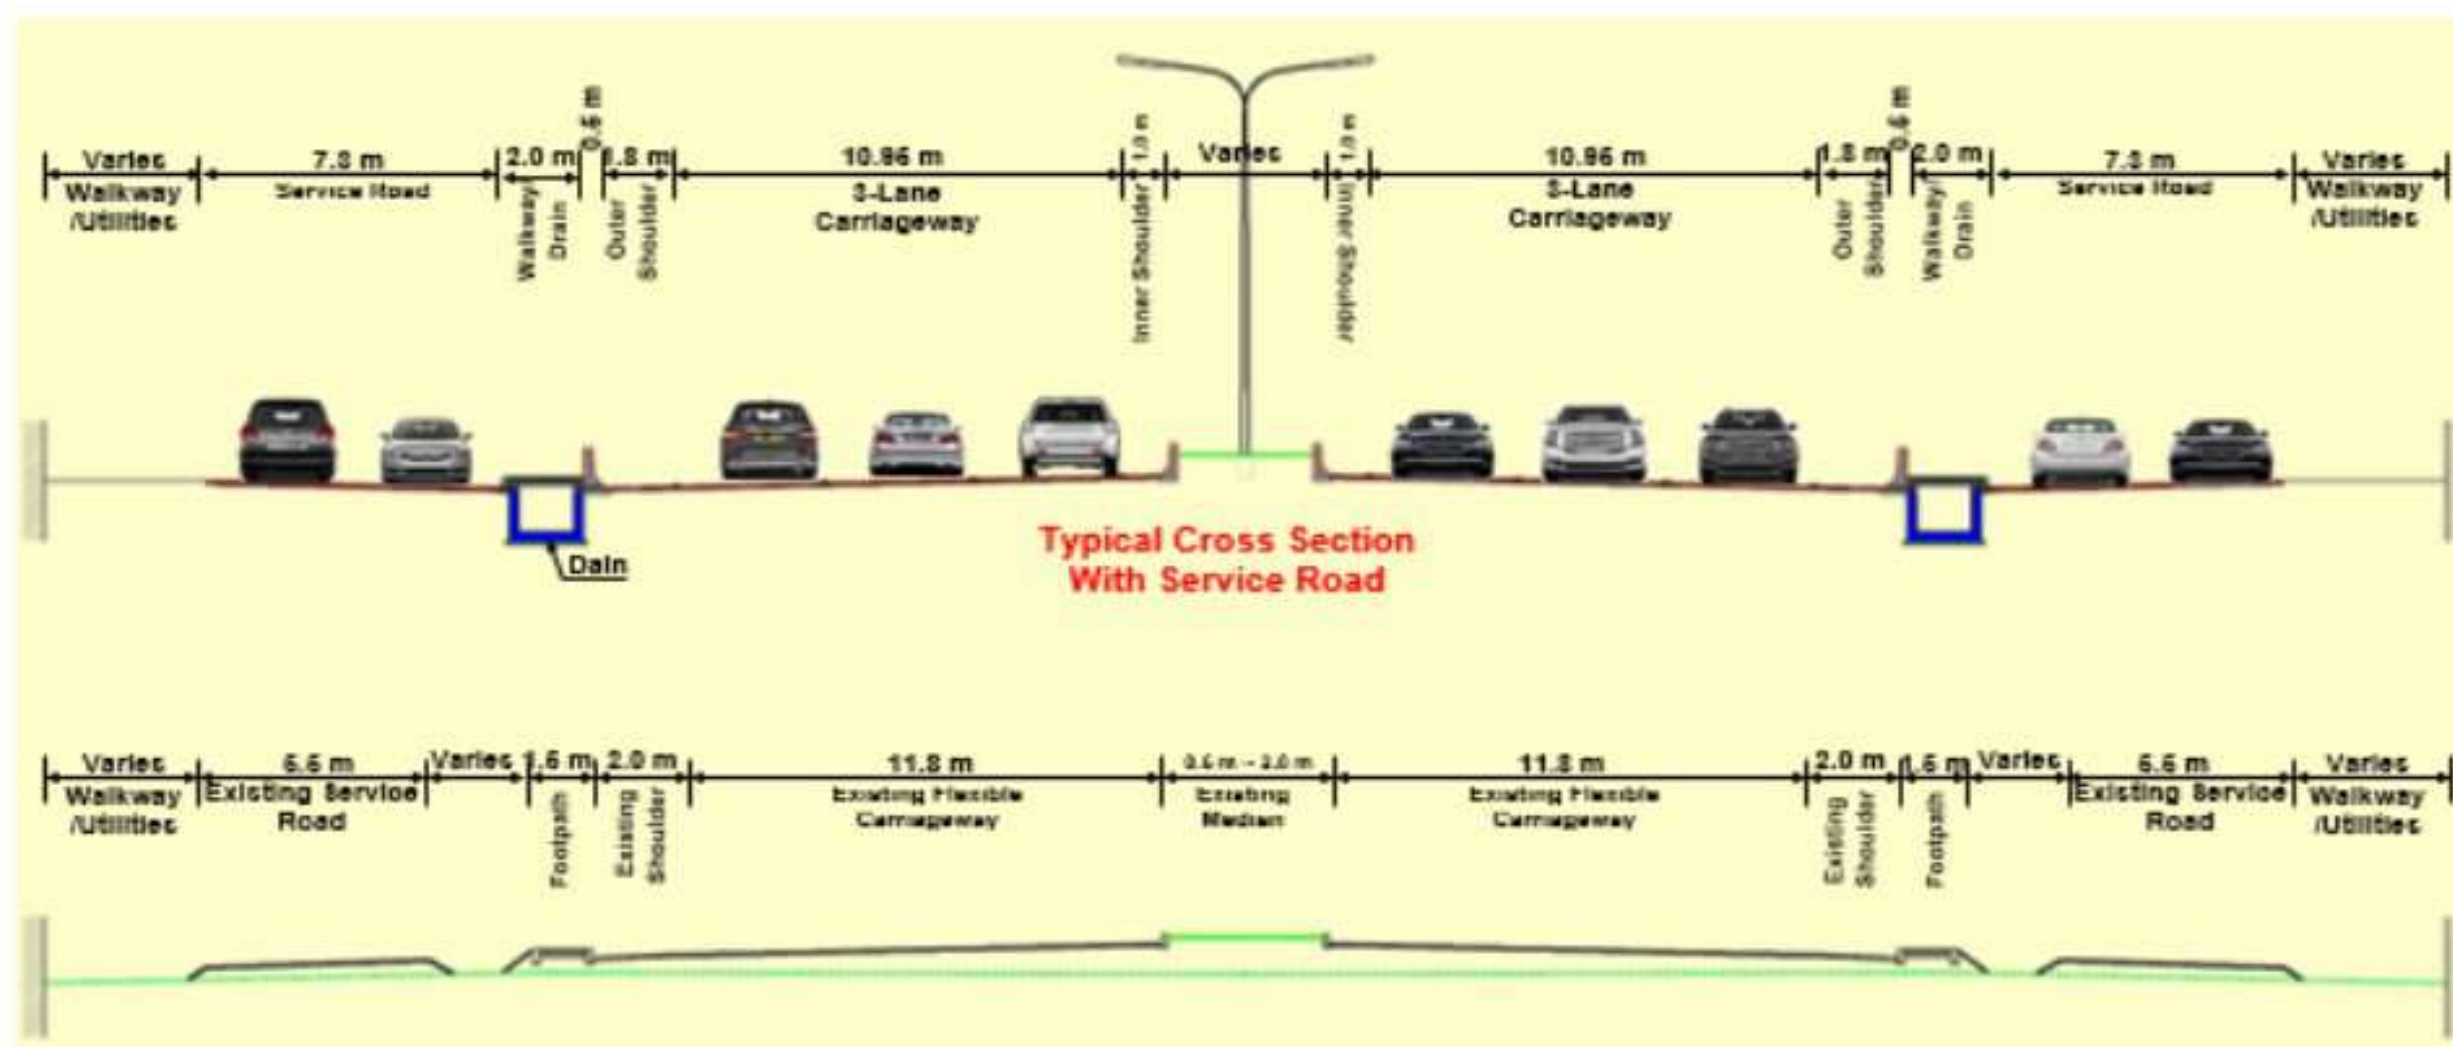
Typical Cross Section of the 6 Lane highway with Service Road
